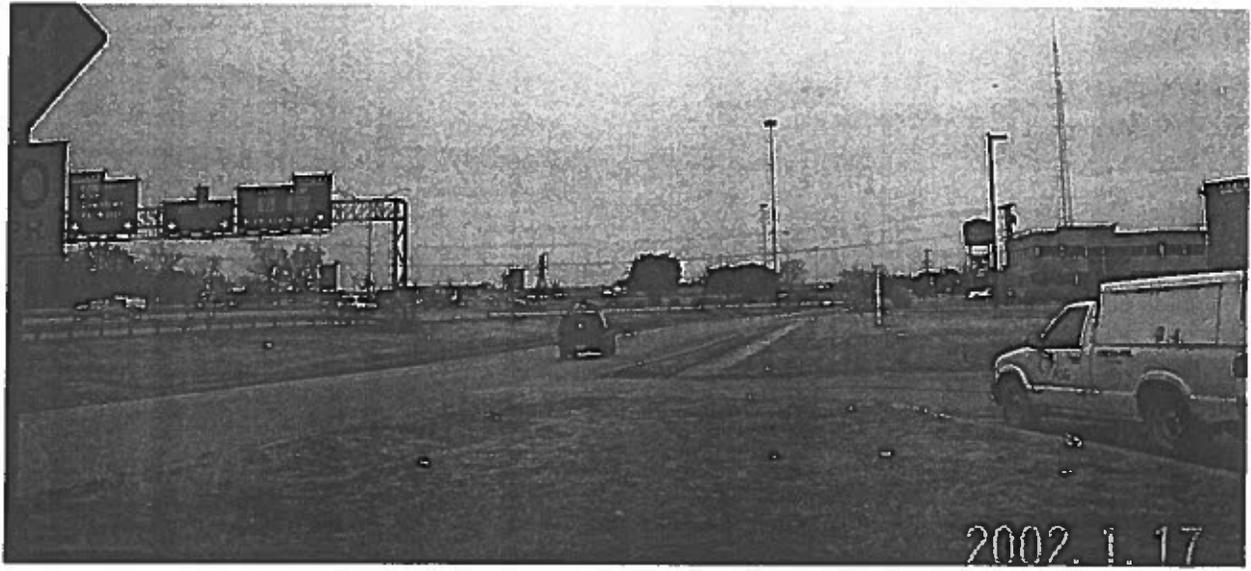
Looking south, along west side of south-bound frontage road from between Calloway Road and Baker Boulevard West (SH 183) at developed areas adjacent to existing right of way. Box for buried telephone cable visible behind driveway, blue pin flags by white truck also indicate buried utilities.
